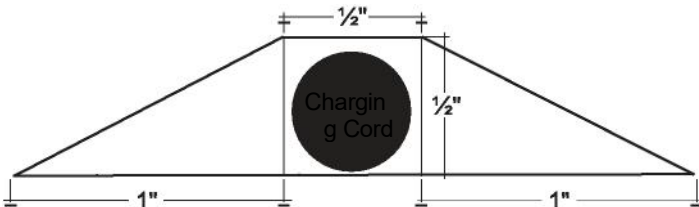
CROSS-SECTION OF RAMP REQUIREMENTS FOR UP TO 1/2 INCH
